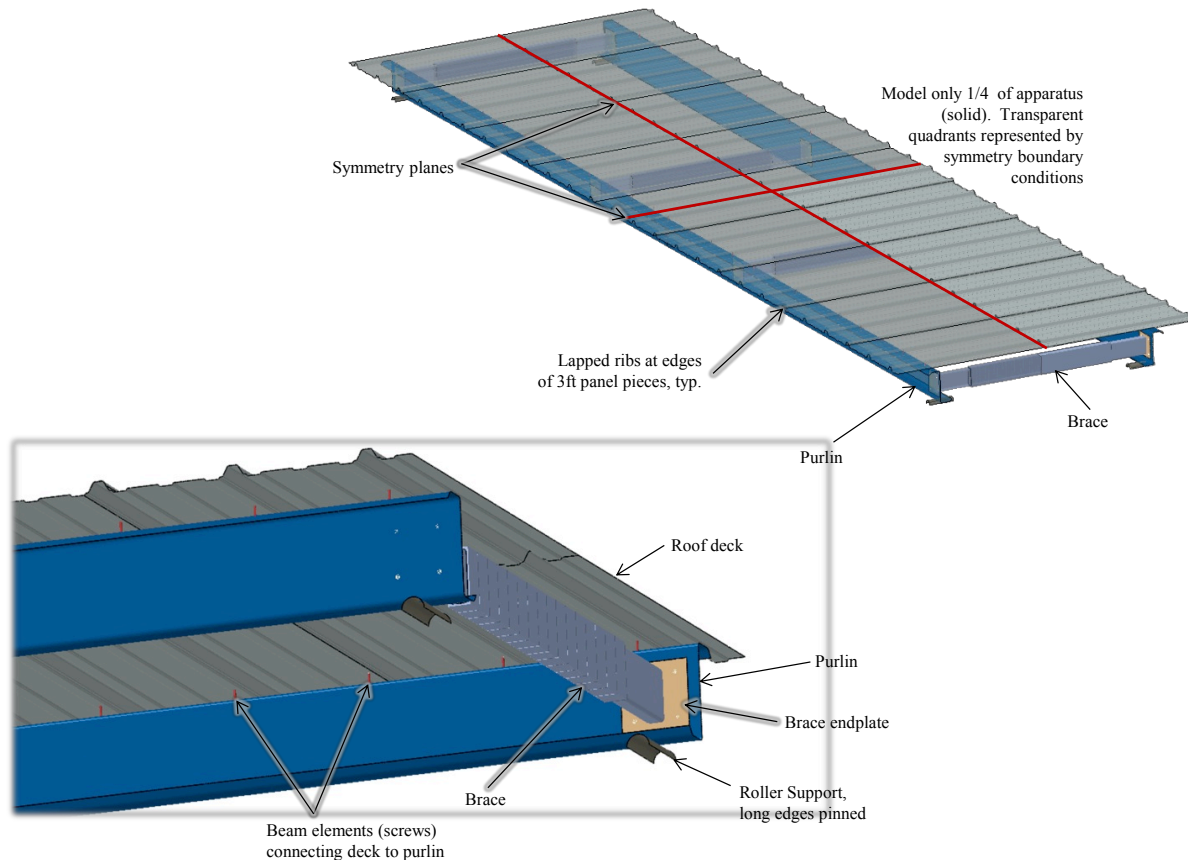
Finite element model showing the purlin, deck, bracing beams, and roller support.
